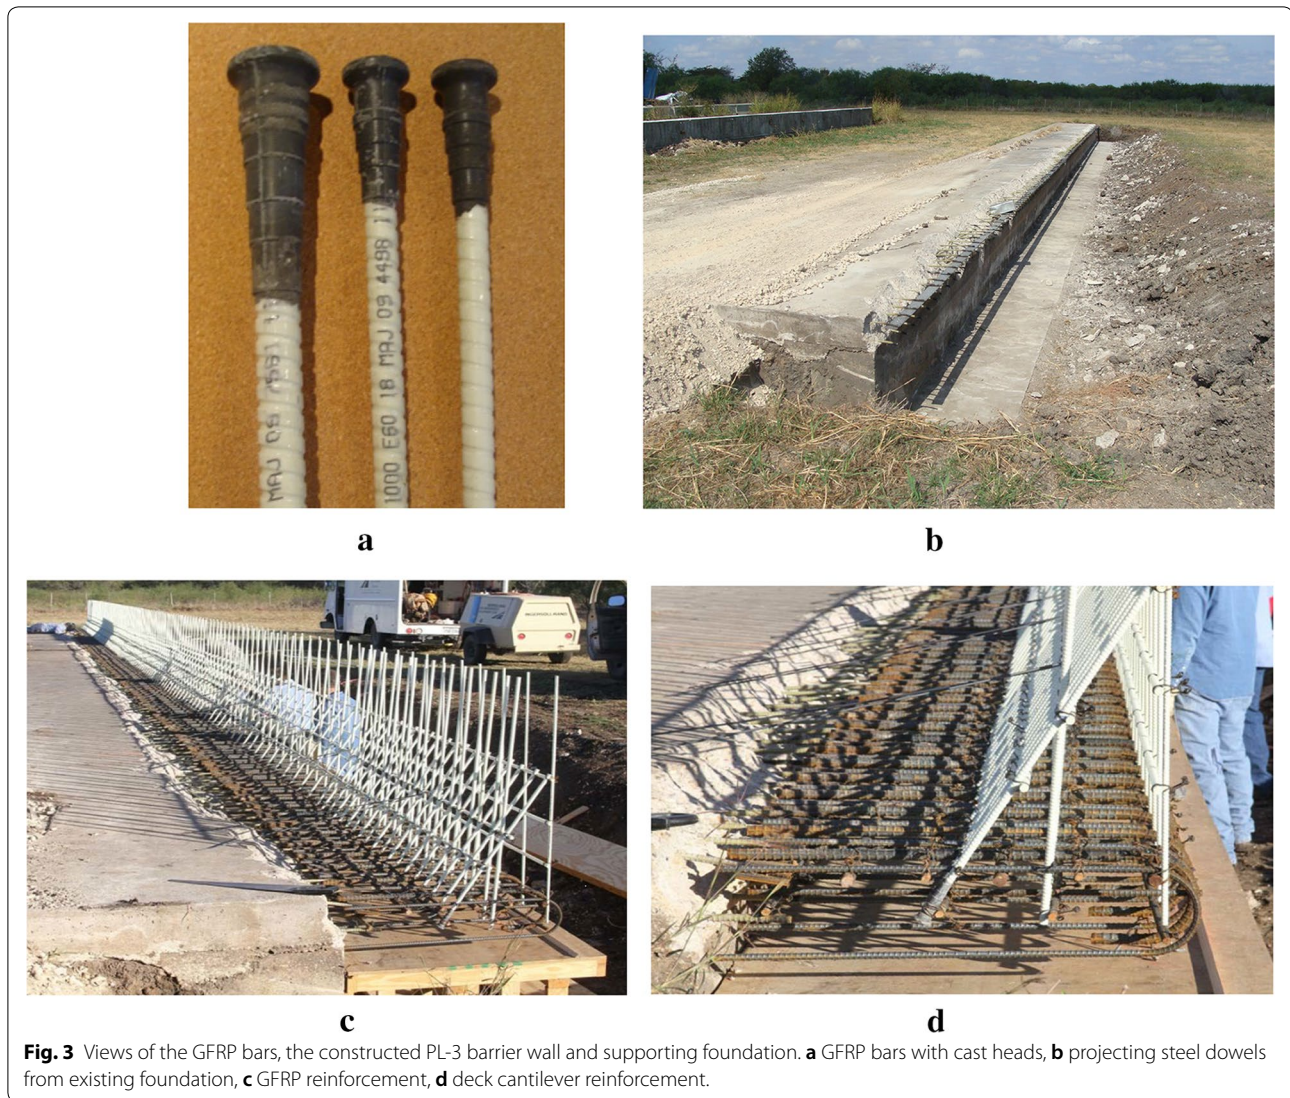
Views of the GFRP bars, the constructed PL-3 barrier wall and supporting foundation. a GFRP bars with cast heads, b projecting steel dowels from existing foundation, c GFRP reinforcement, d deck cantilever reinforcement.
